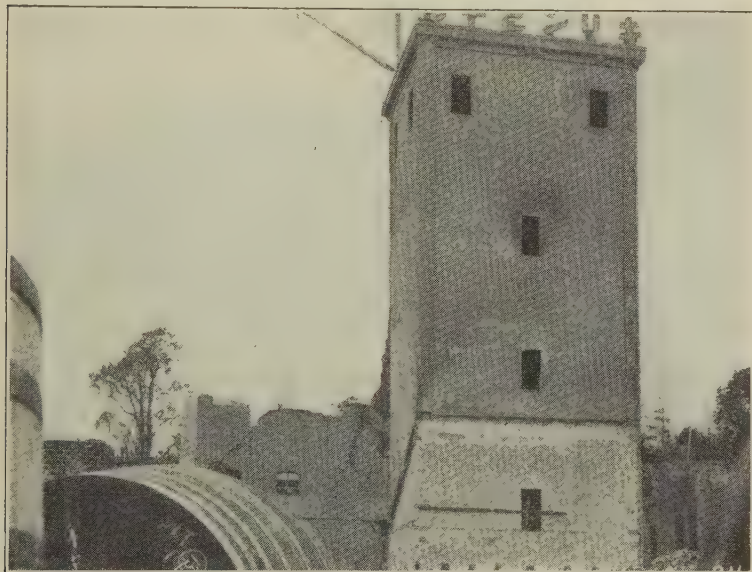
KIRIN BREWERY—YOKOHAMA.
